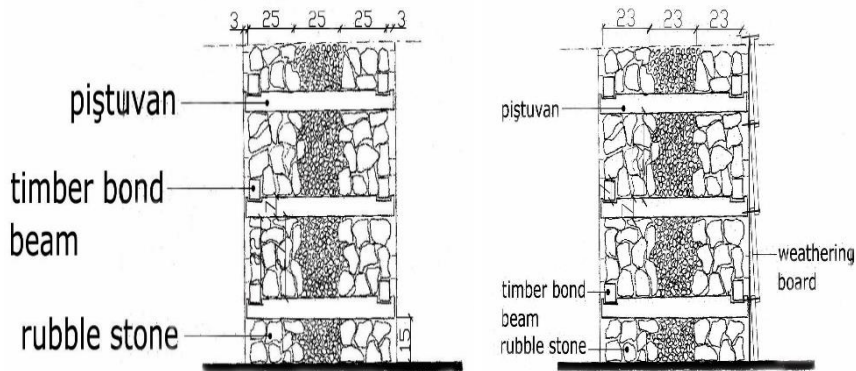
Drawing of the Walls with Covering Material (Çelik 2009)
